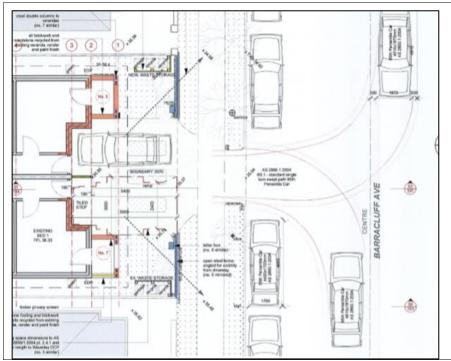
The approved plans for Nos. 5 and 7 Barracluff Avenue. The existing hardstand at No.7 will, when the DA is completed, be shared with No.5 to provide 2 on-site spaces at the expense of only 1 kerbside space.
